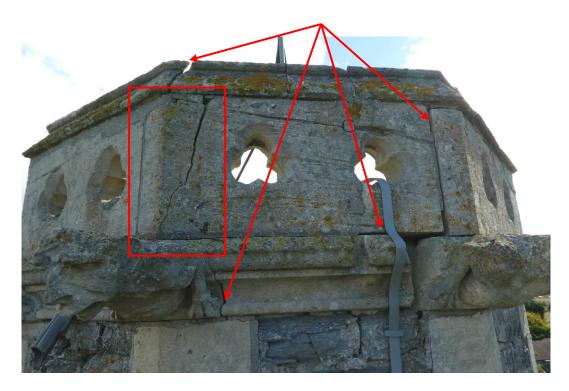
P1000396 Masonry Fracture & Open Joints in Stair Turret Parapet Panel West Elevation
